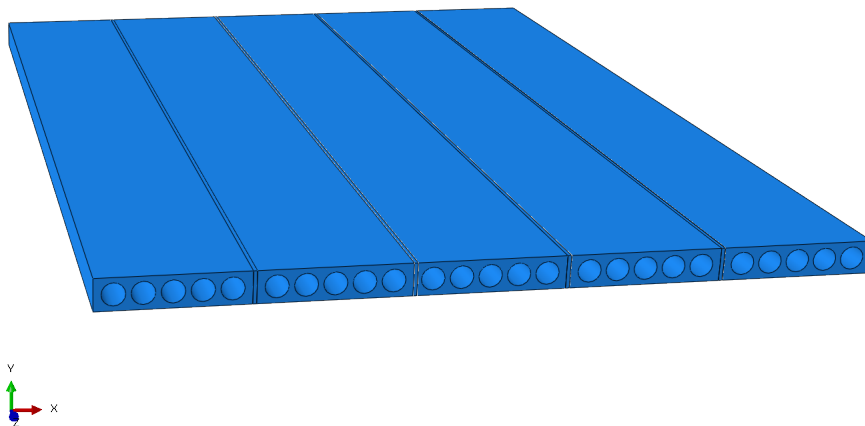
Hollow core floor system consisting of five slabs and cast concrete joints.
